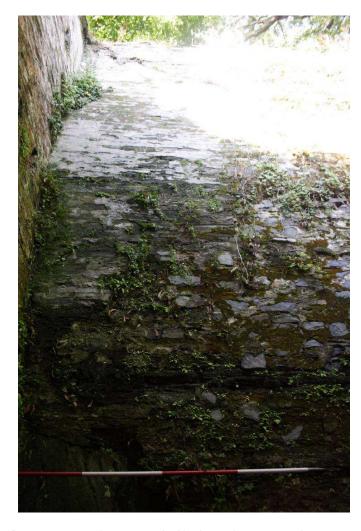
Southwestern half of southeastern elevation of Upper part of curtain wall in Room 3 of Stables, 2m scale
